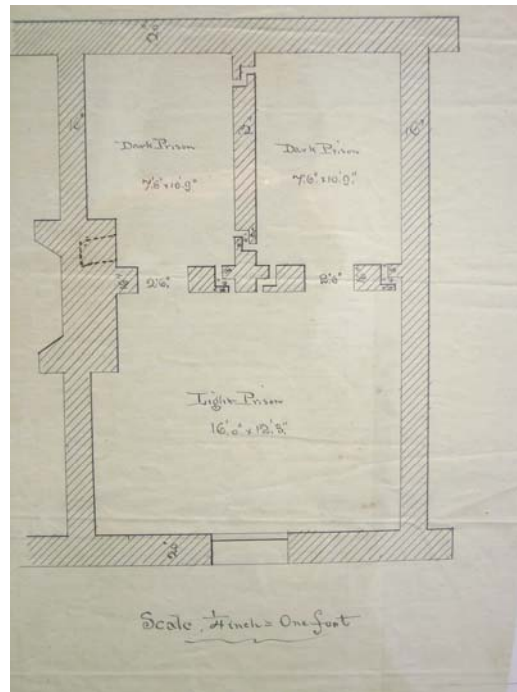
Proposed arrangement of light and dark prisons in the basement of the east barrack (Building 202), June 1857.
